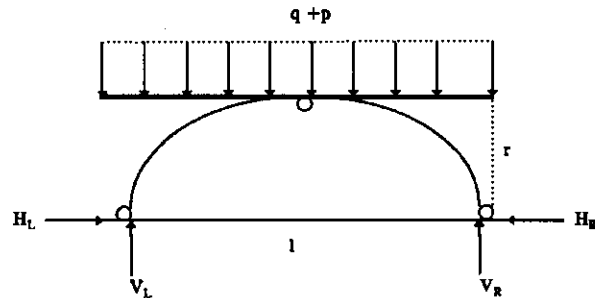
Three-hinged arch with vertical distributed loading on entire span, plus full-span live load.
